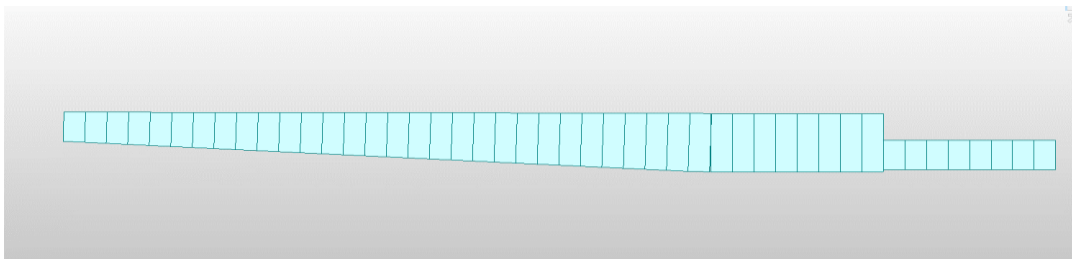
Model of half bridge (Mouchel/WSP, 2017)
